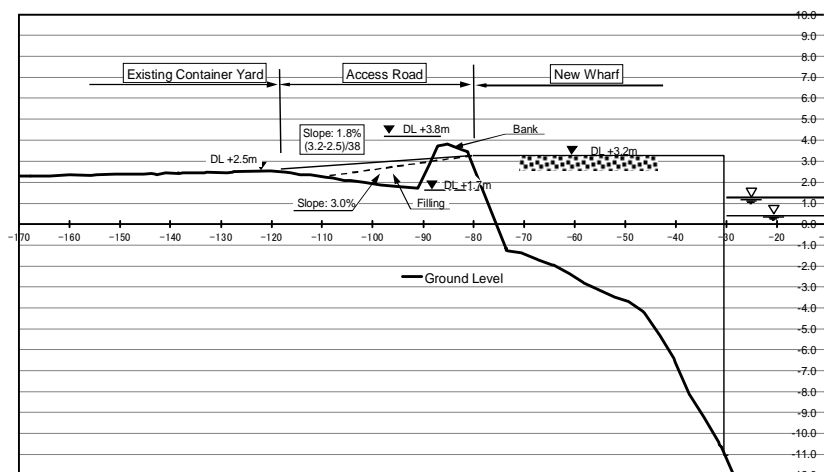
Longitudinal Section of South Access Road
